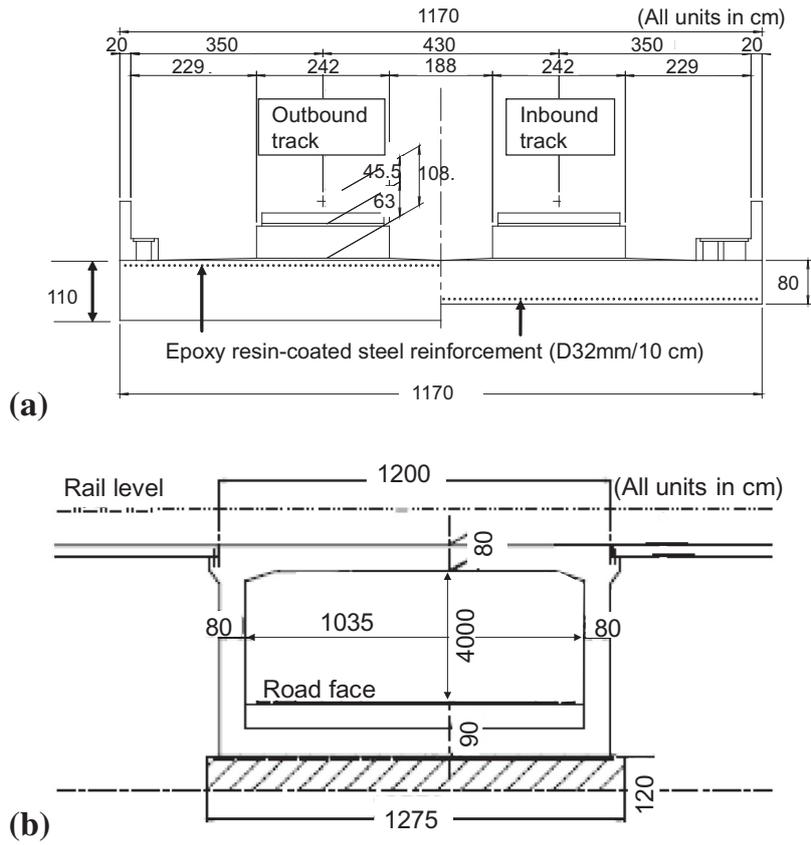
Box culver (the original plan): (a) transversal cross-sections of the girder at the top of the facing (left) and the center (right); and (b) longitudinal cross-section of the bridge.
